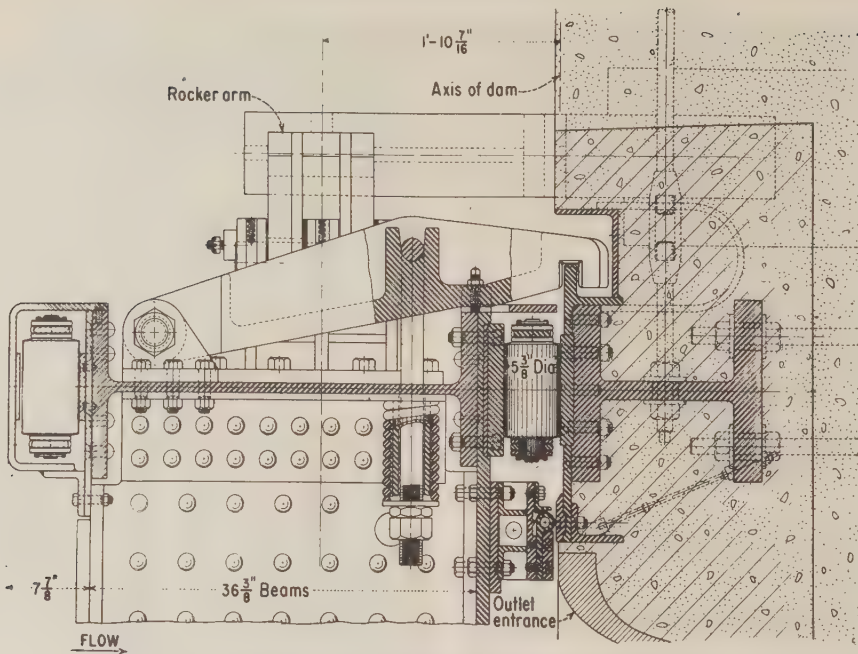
SHASTA DAM OUTLET COUNTER GATE SLOT SECTION
